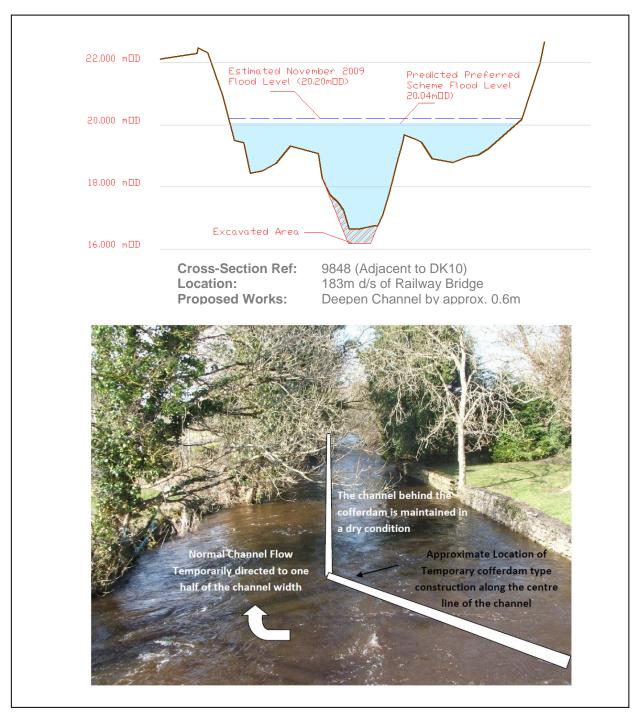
Proposed Works Channel Works in the vicinity of Craughwell Village and sketch of cofferdam location
